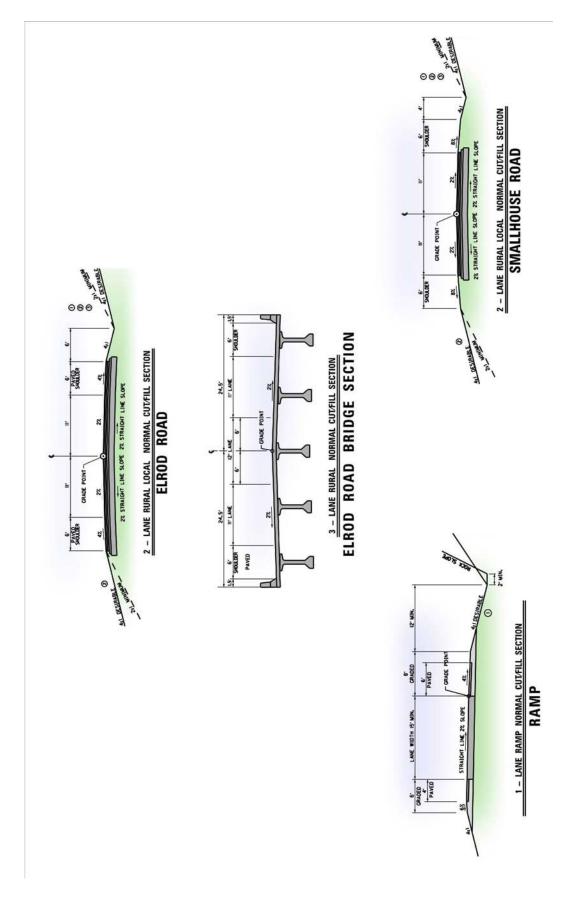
Proposed Typical Sections with Practical Design guidelines applied
